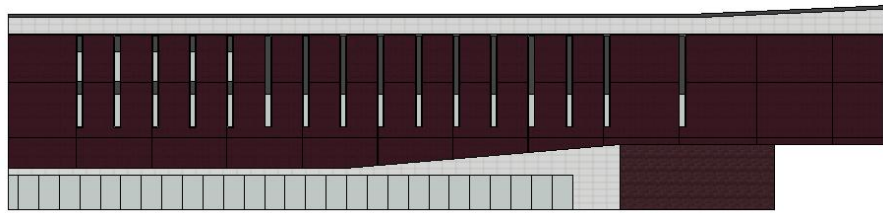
Original South Facade with Expansion Joints and Brick Angles (2)
